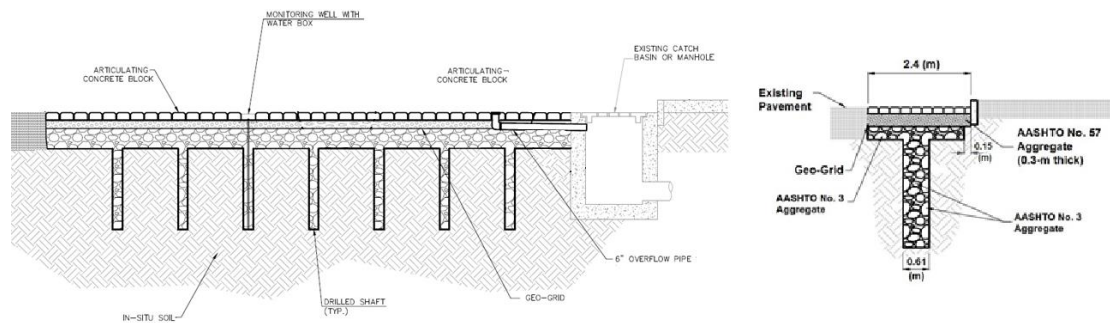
Longitudinal cross section (left) and cross section view (right) of permeable pavement 17 H (shaft system)
